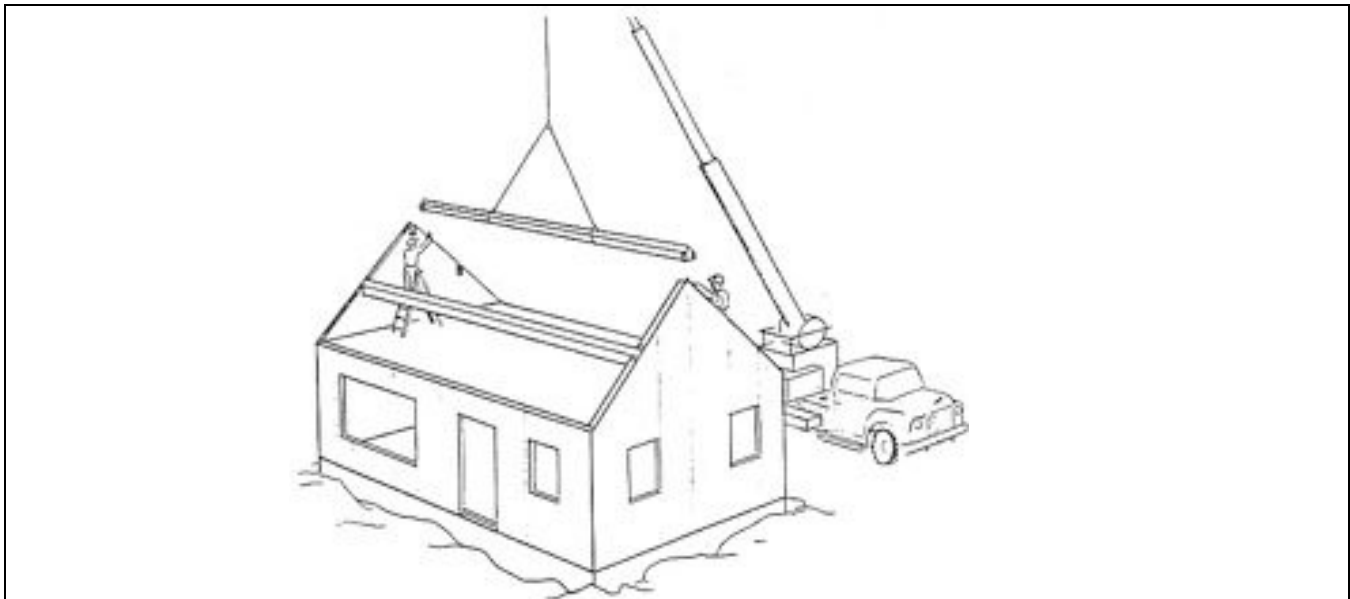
Setting Roof Beams: Beams are most easily installed with a crane. Finish all the prep work (securing scabs, installing joist hangers, etc.) before the crane arrives to reduce idle crane time.
